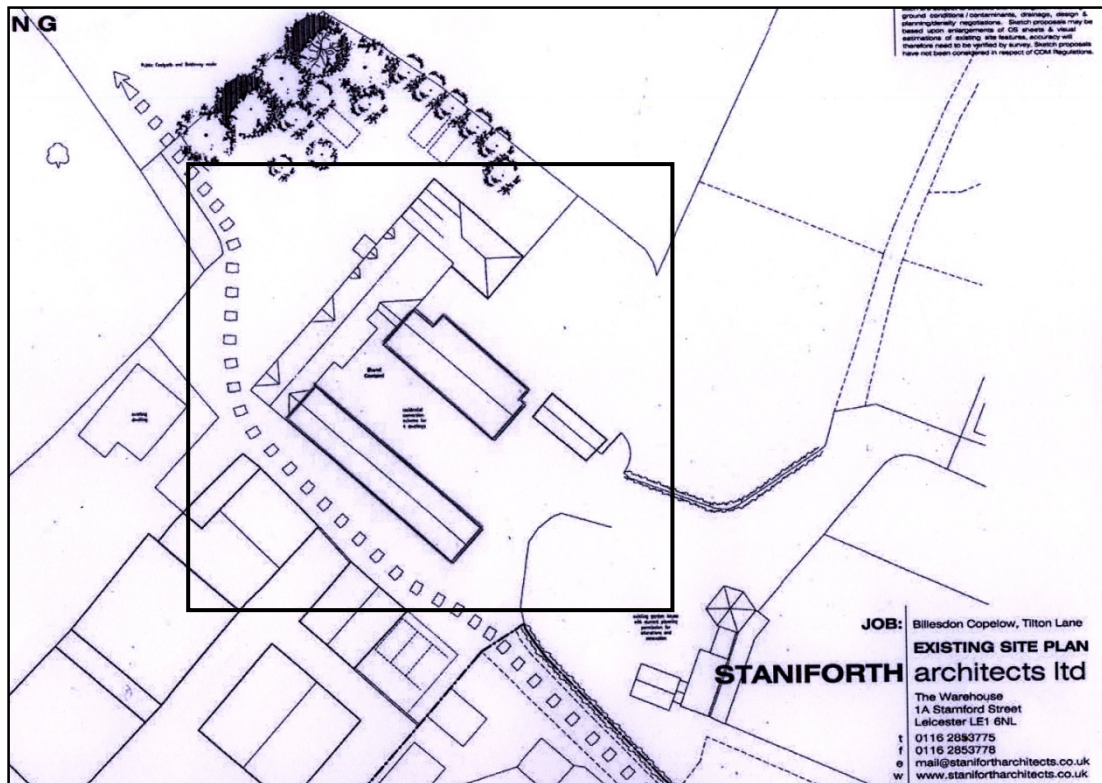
Site plan (supplied by Staniforth Architects; not to scale)
